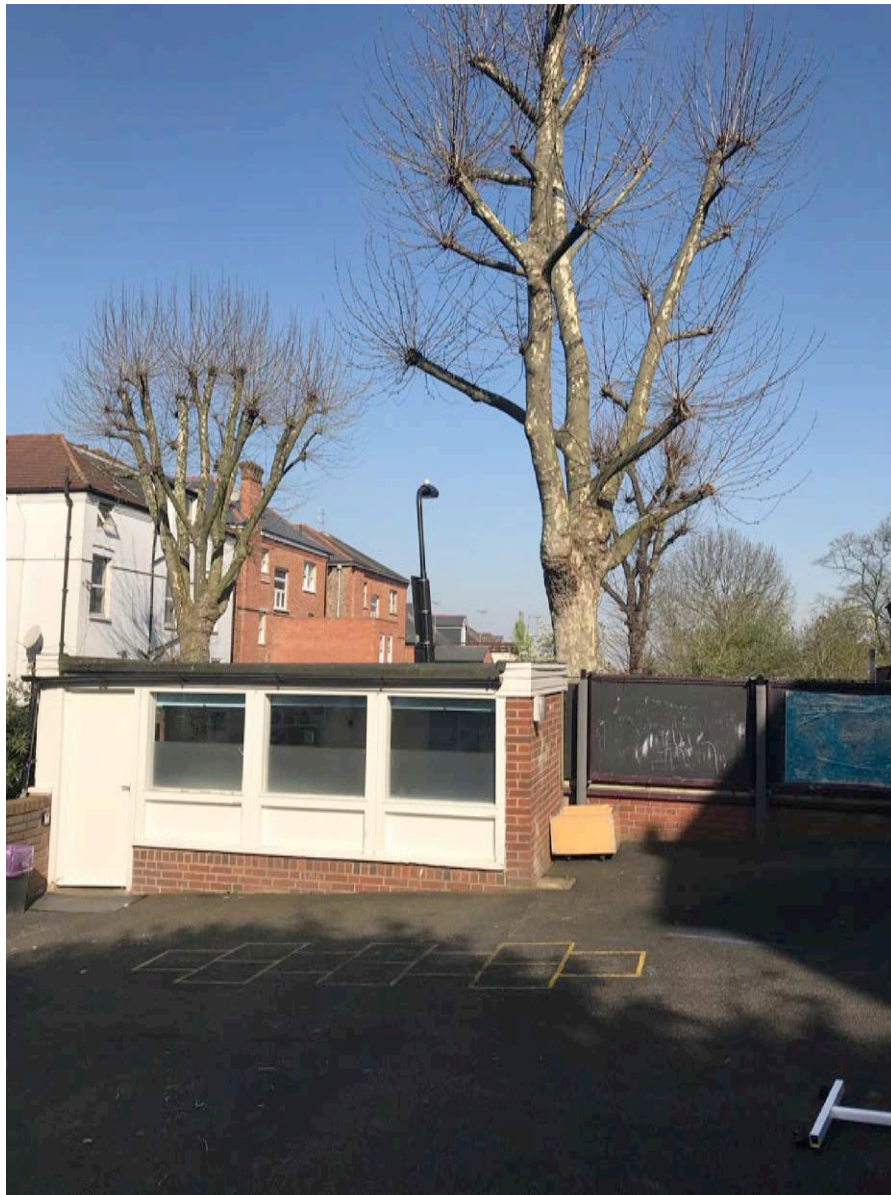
Illustrates proximity of T1 to school boundary wall (proposed site of new design build)
